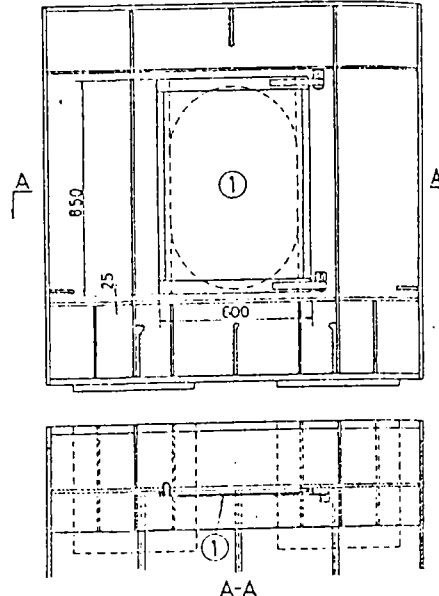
Detail of access door to ends of box girders. (1) Frame with galvanised weldmesh.
